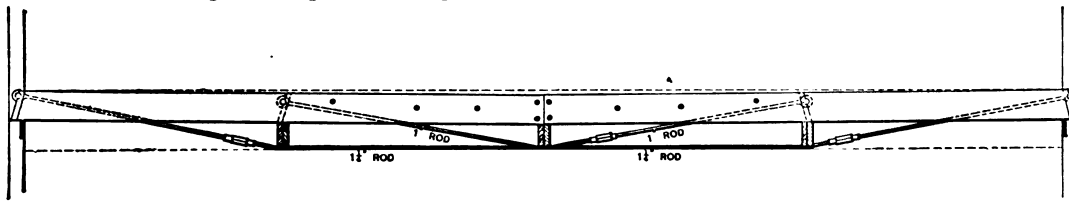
Side of First Floor Joists, Showing Method of Trussing.
